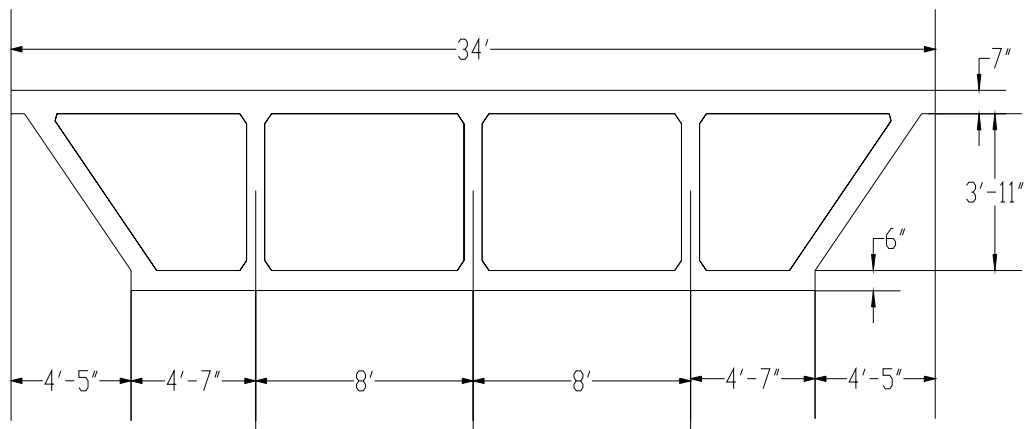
Cross Section of 1RWL-2RWL Off-Ramp Bridge Deck (reinforcement not shown, drawing not to scale)
